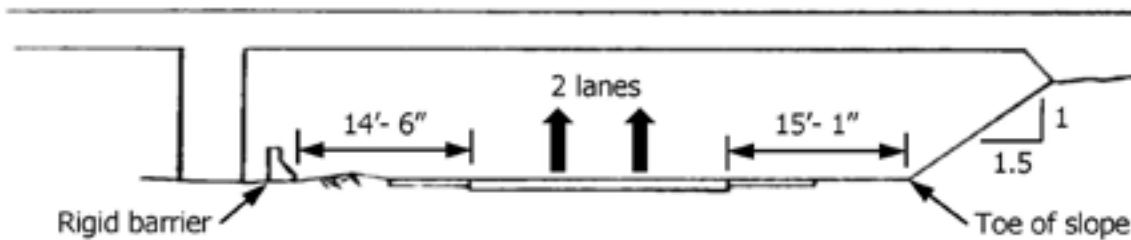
Bridge elevation view of horizontal clearances for a 2-lane, 1-way highway feature below the bridge, with a rigid barrier.
